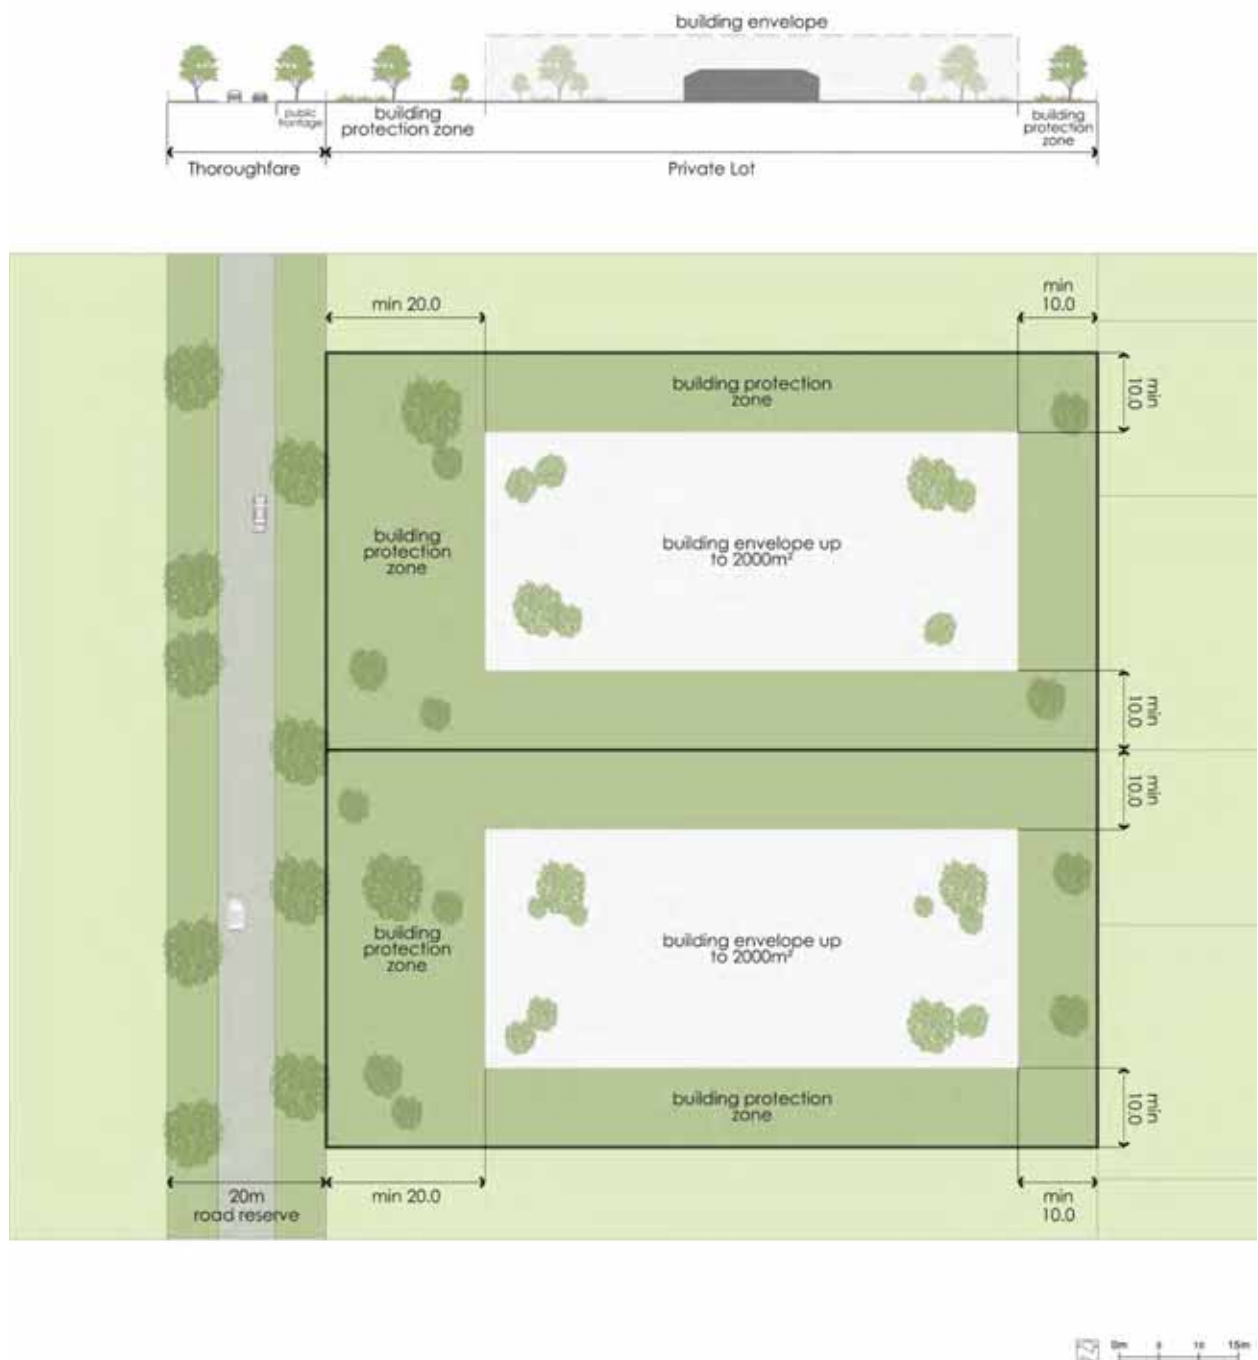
INDICATIVE BUILDING ENVELOPES AND CROSS-SECTION – TYPICAL LOTS
